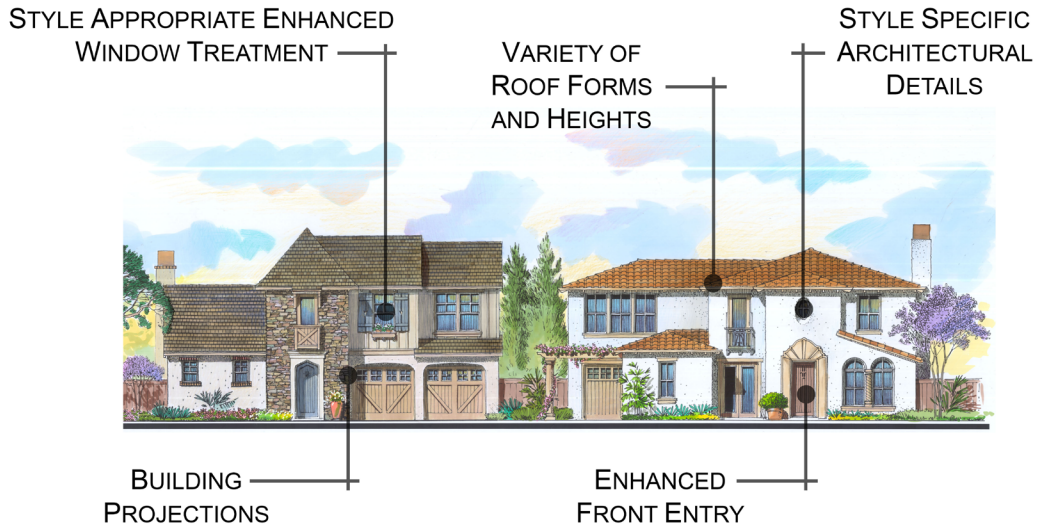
Conceptual Building Type A - Single-Family Detached Front Loaded
